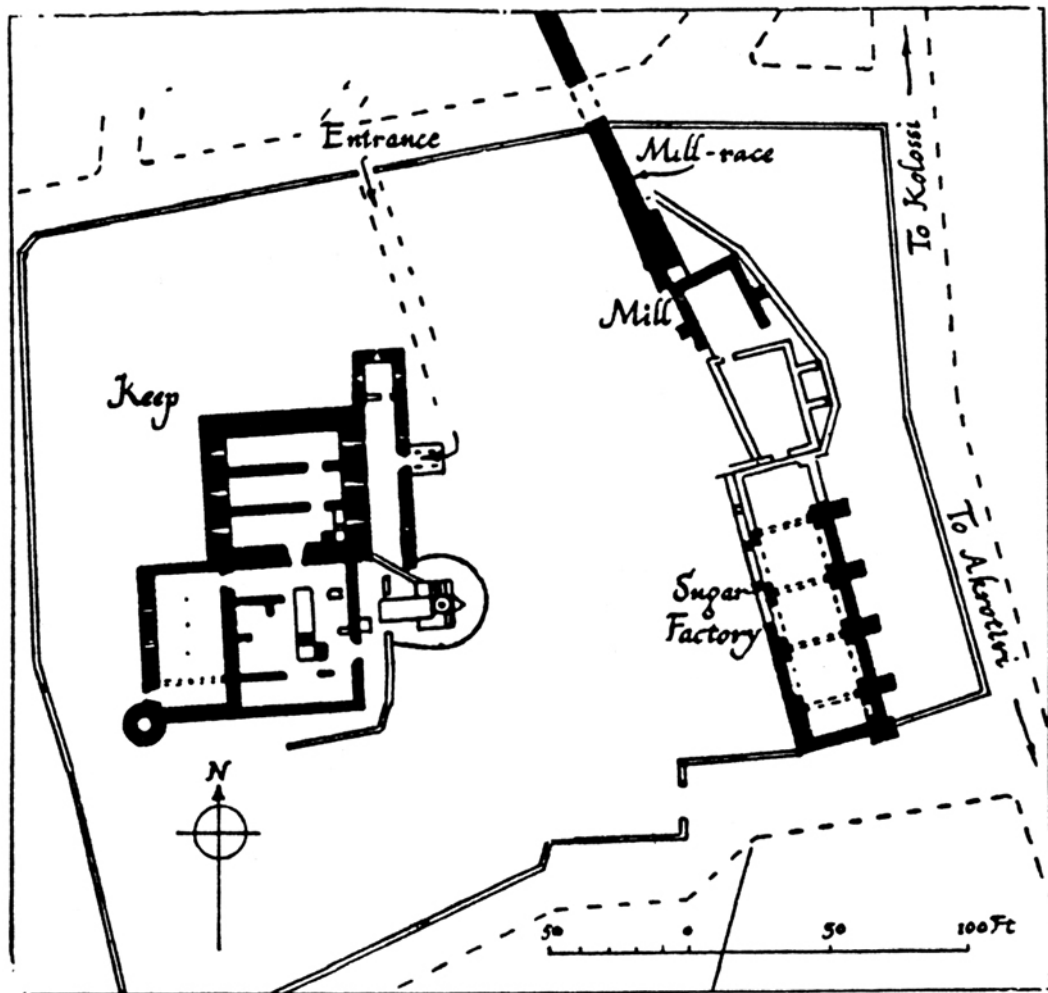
Plan Of The Hospitaller Tower Of Kolossi.
